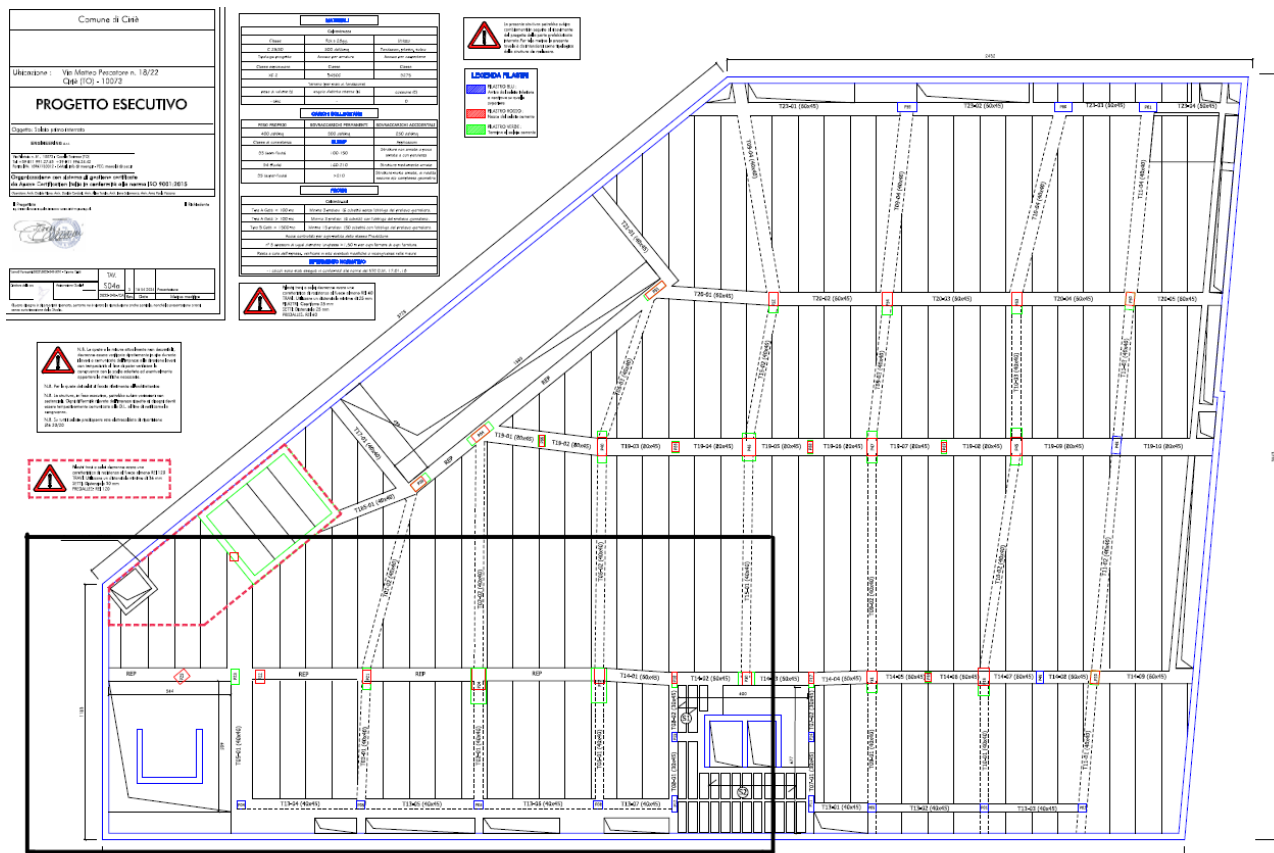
Structural design plan of “floor -1” to highlight the portion considered in the example in Figure 125.
